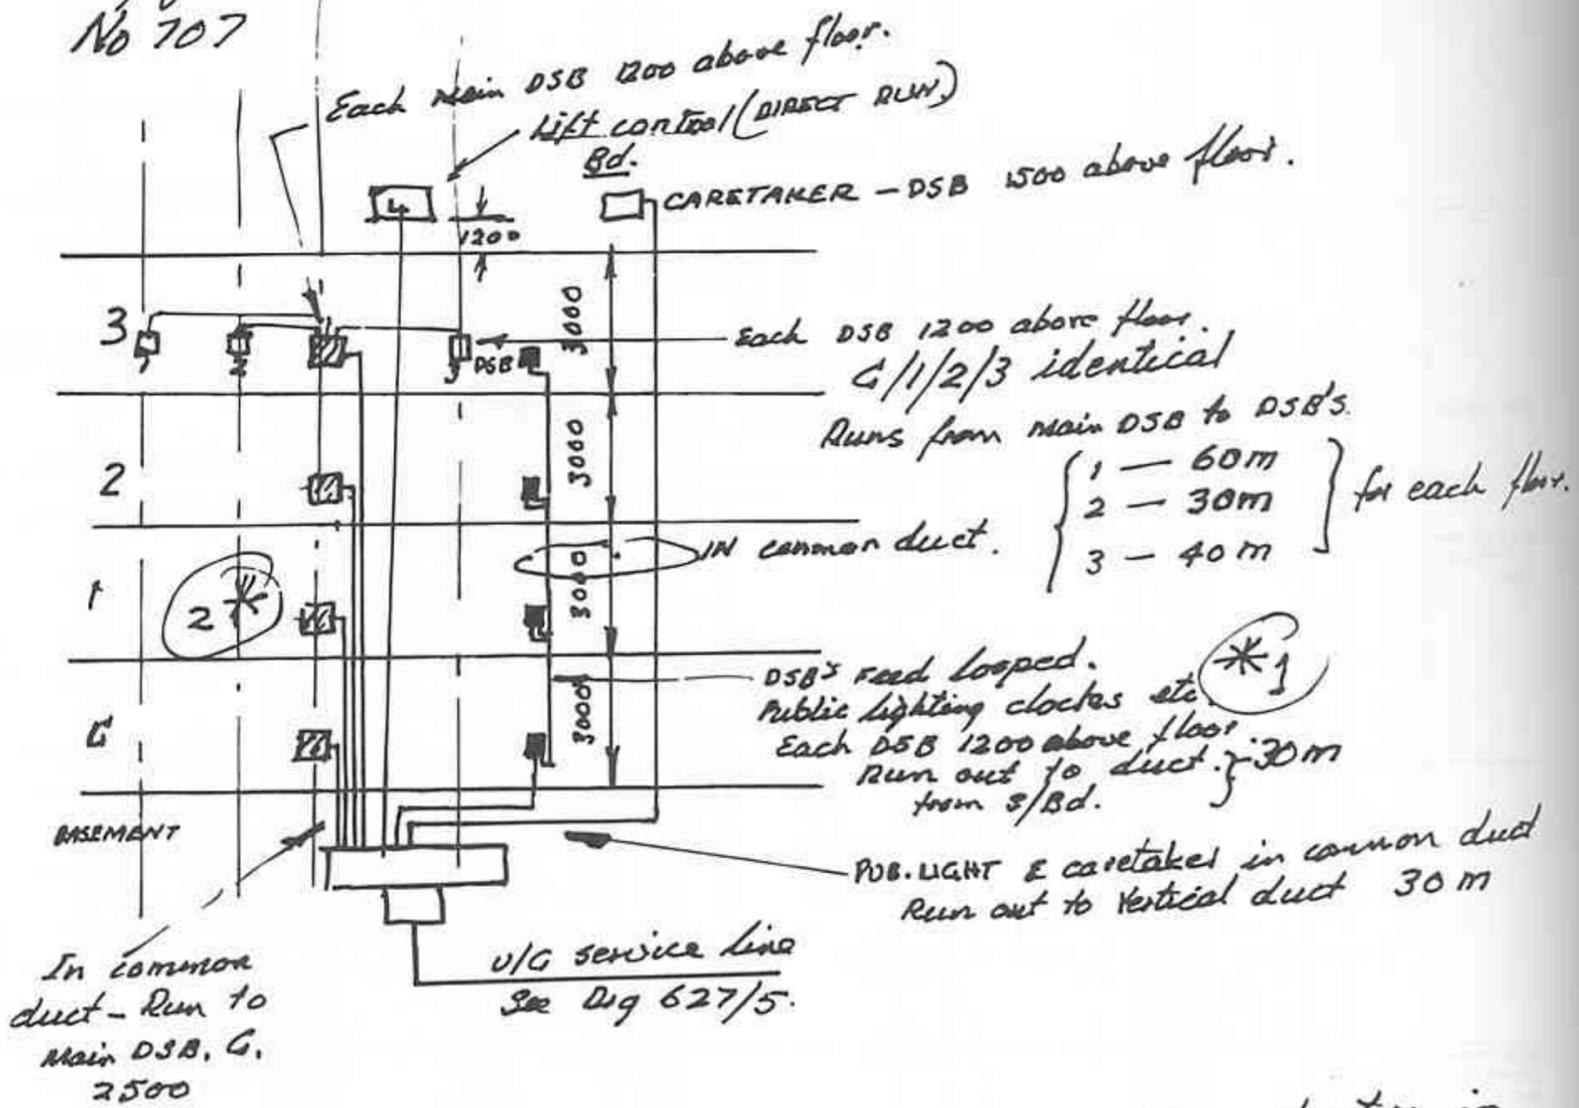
Floor plan of the commercial building in Fig. 6.48 TAFE COMMISSION, NSW
